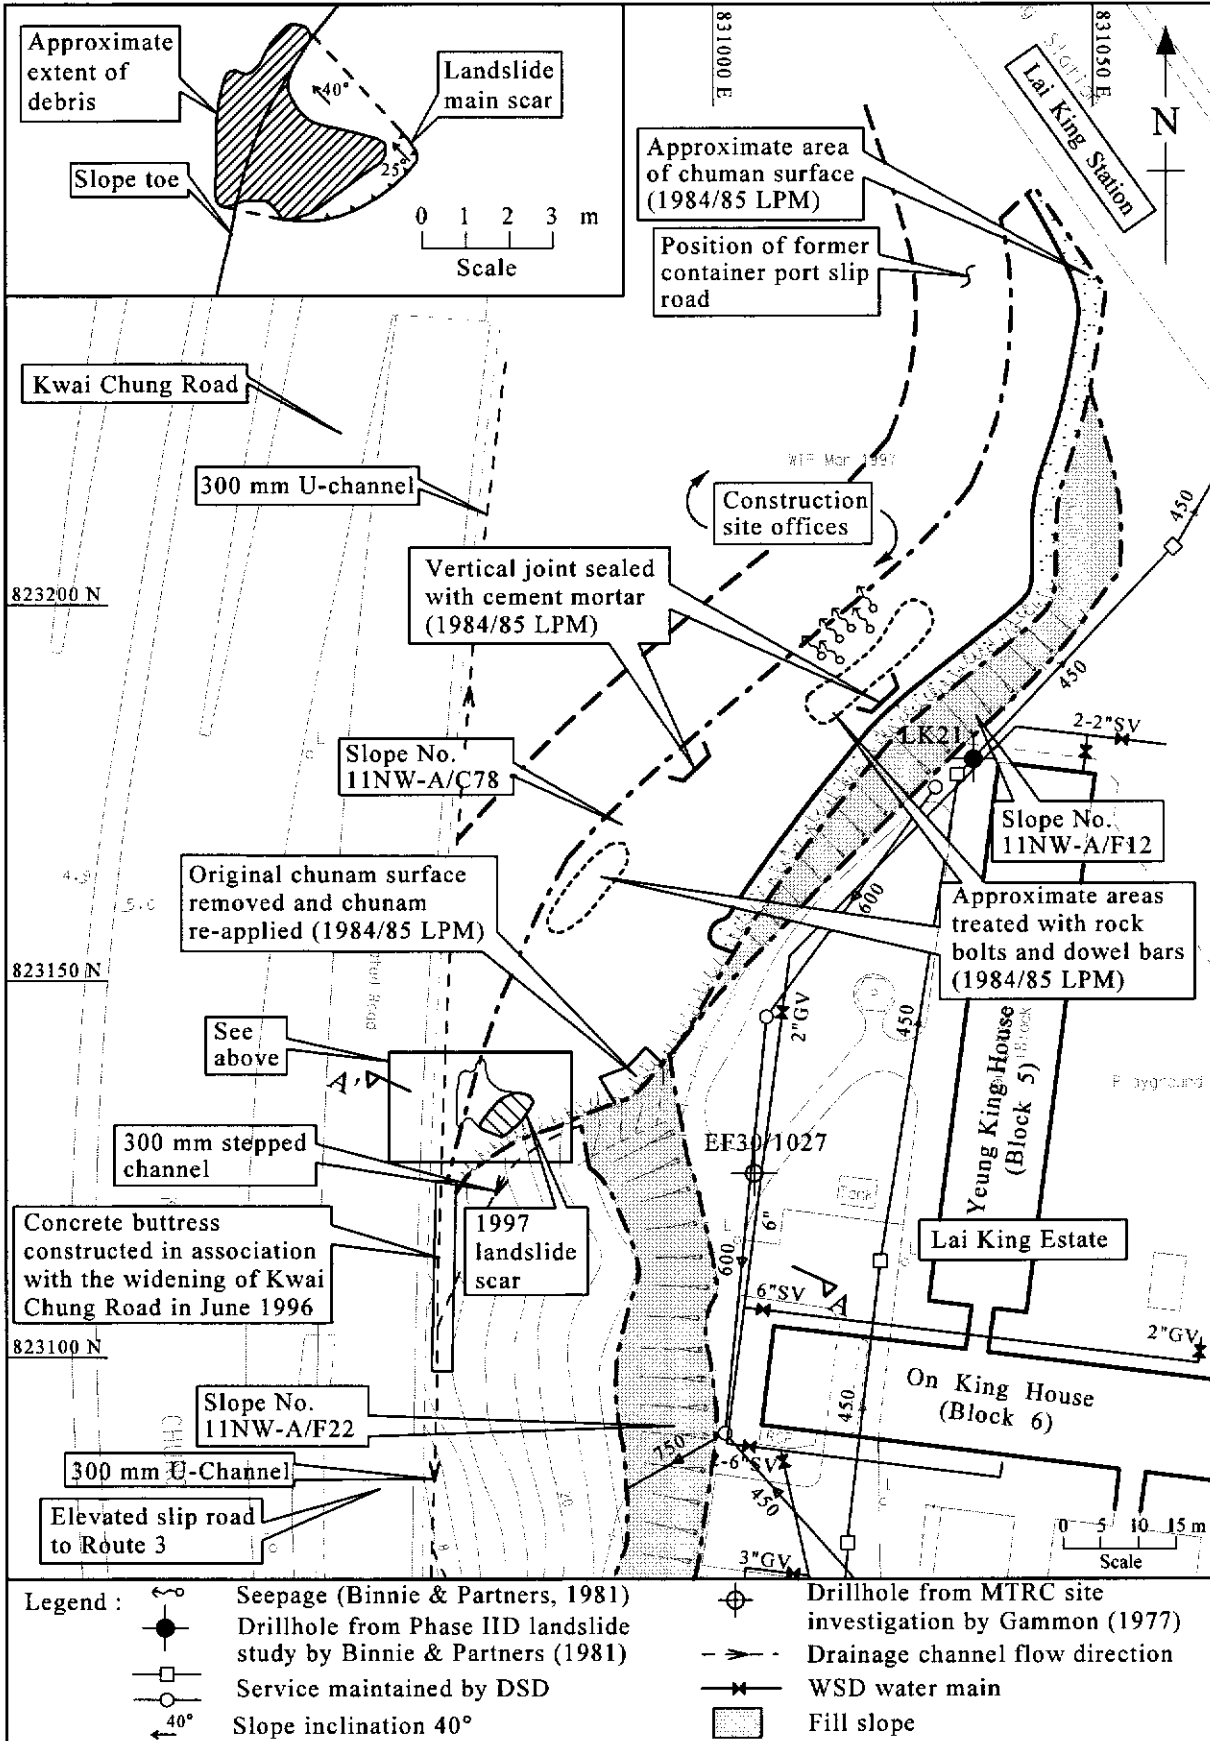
Site Plan (GEO Incident No. MW97/6/21)
